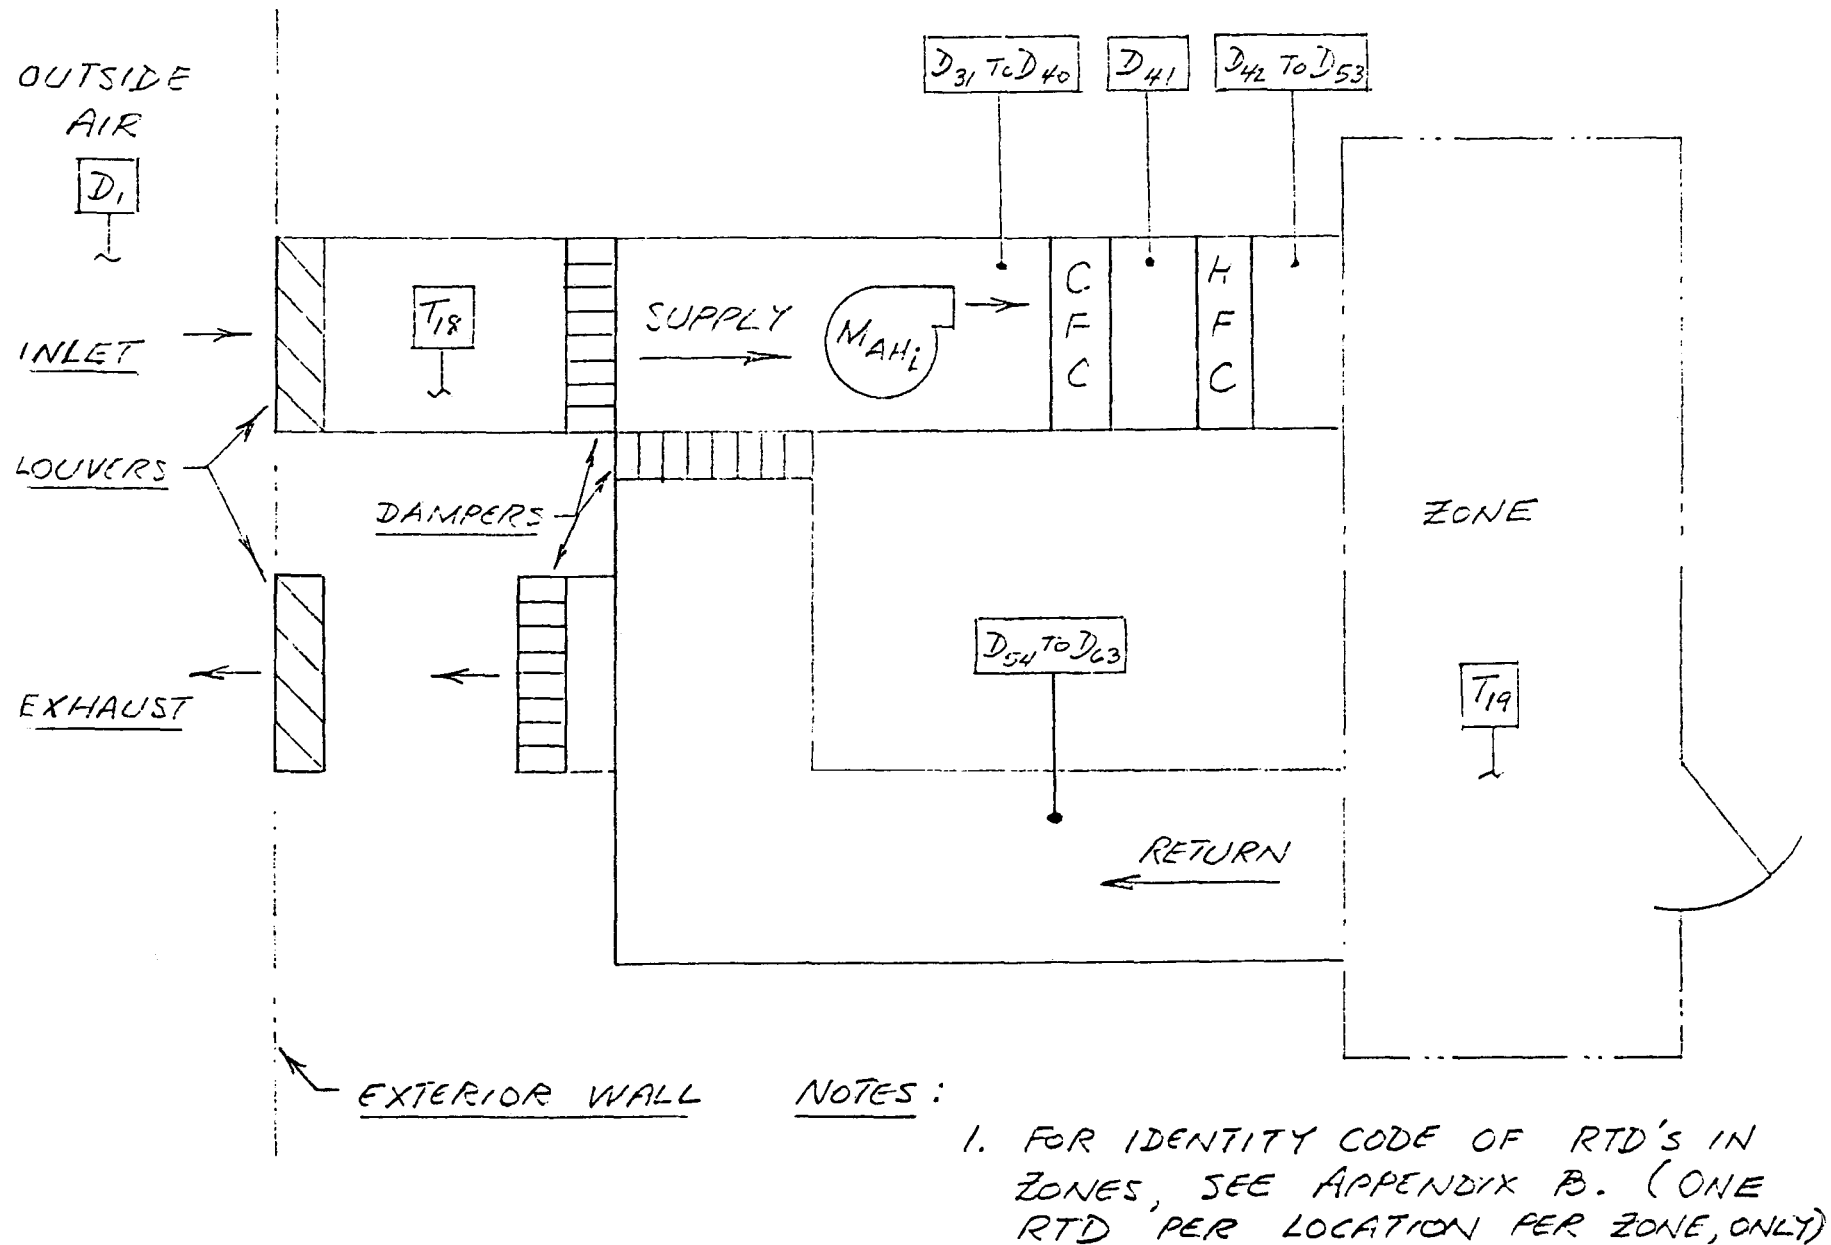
Typical Zone Duct Arrangement With Instrumentation
